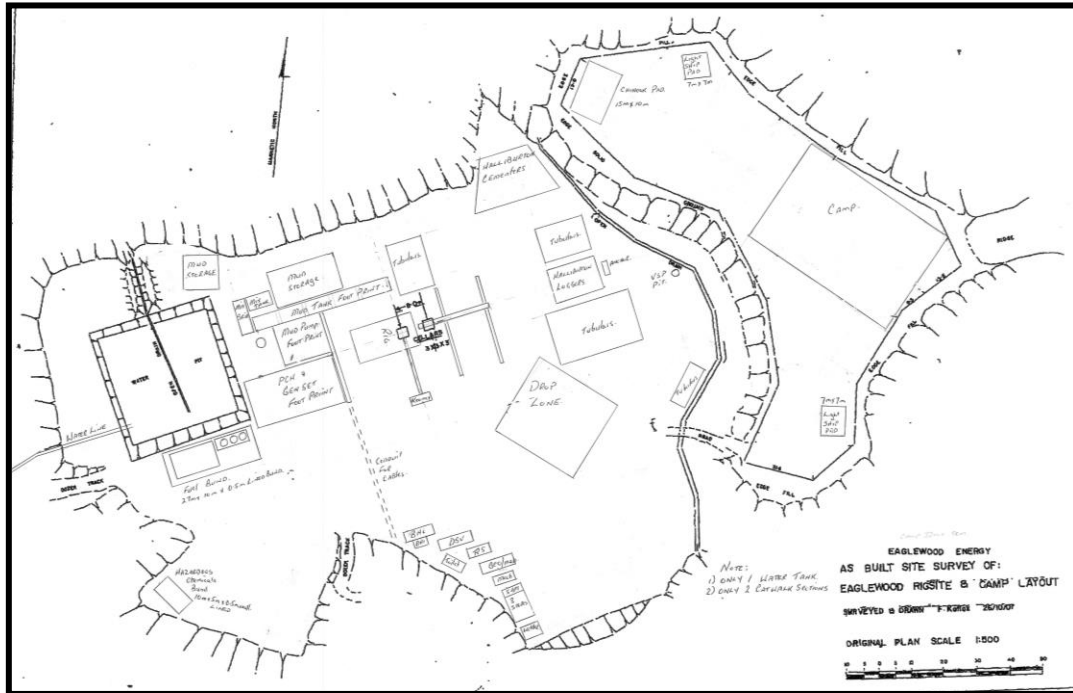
The layout of Eaglewood Energy Rig Site and Camp facilities at Ubuntu 1.
